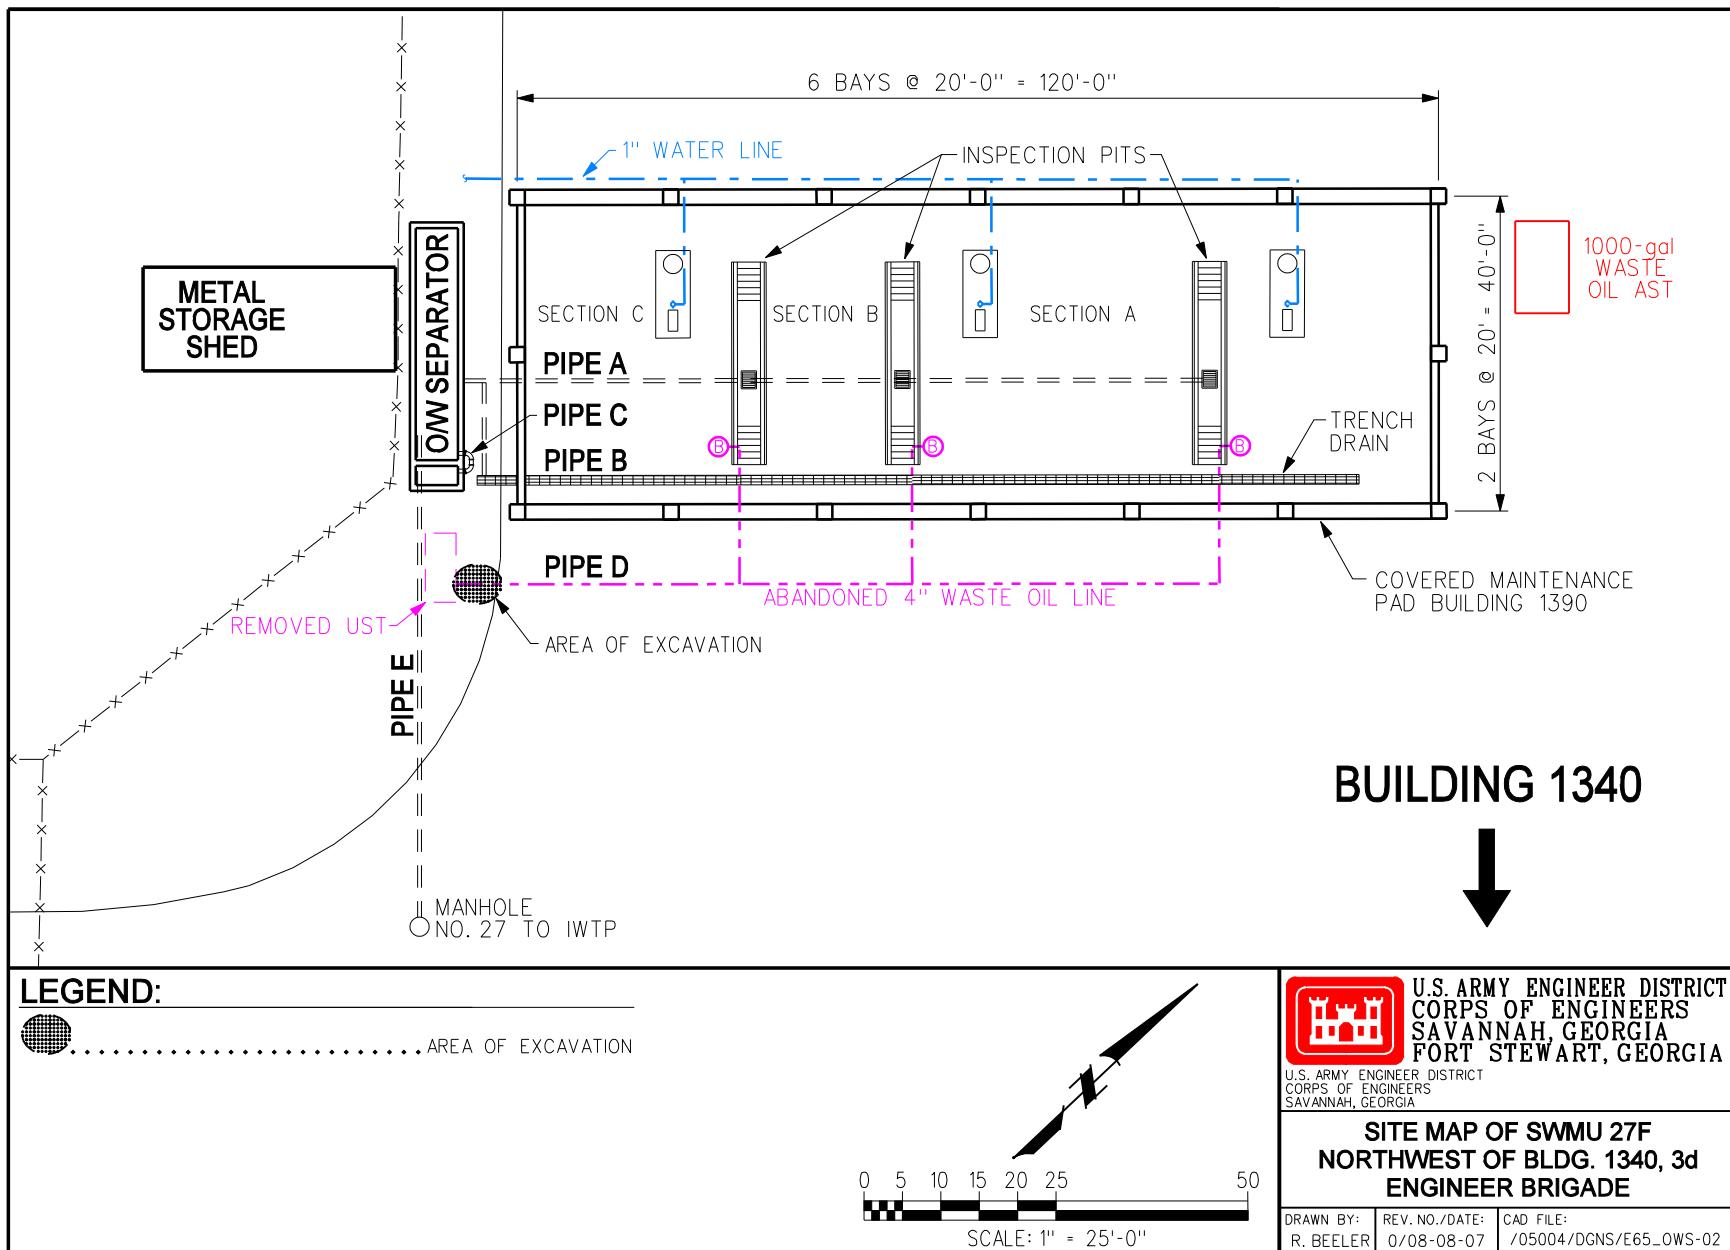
OWS and Piping Layout of Maintenance Pad at SWMU 27F, Northwest of Building 1340
